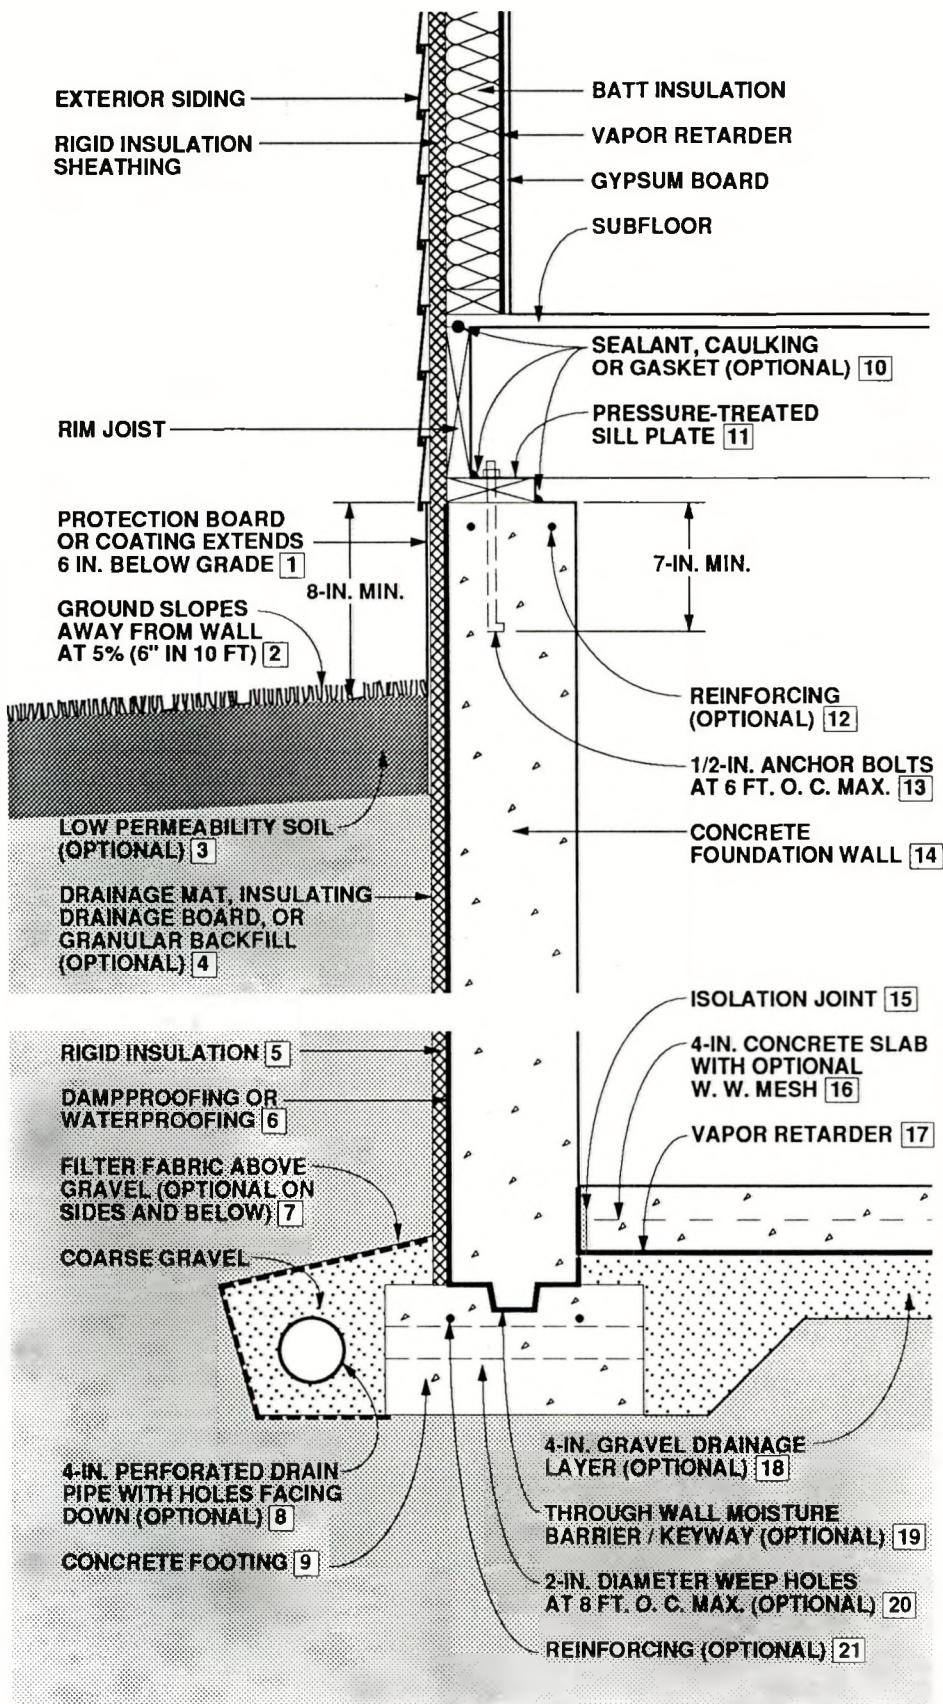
illustrates a concrete foundation wall with exterior insulation. The rigid insulation also serves as sheathing over the 2 x 4 wood frame wall above grade. This approach can be used for rigid insulation that is 1.5 inches thick or less.
